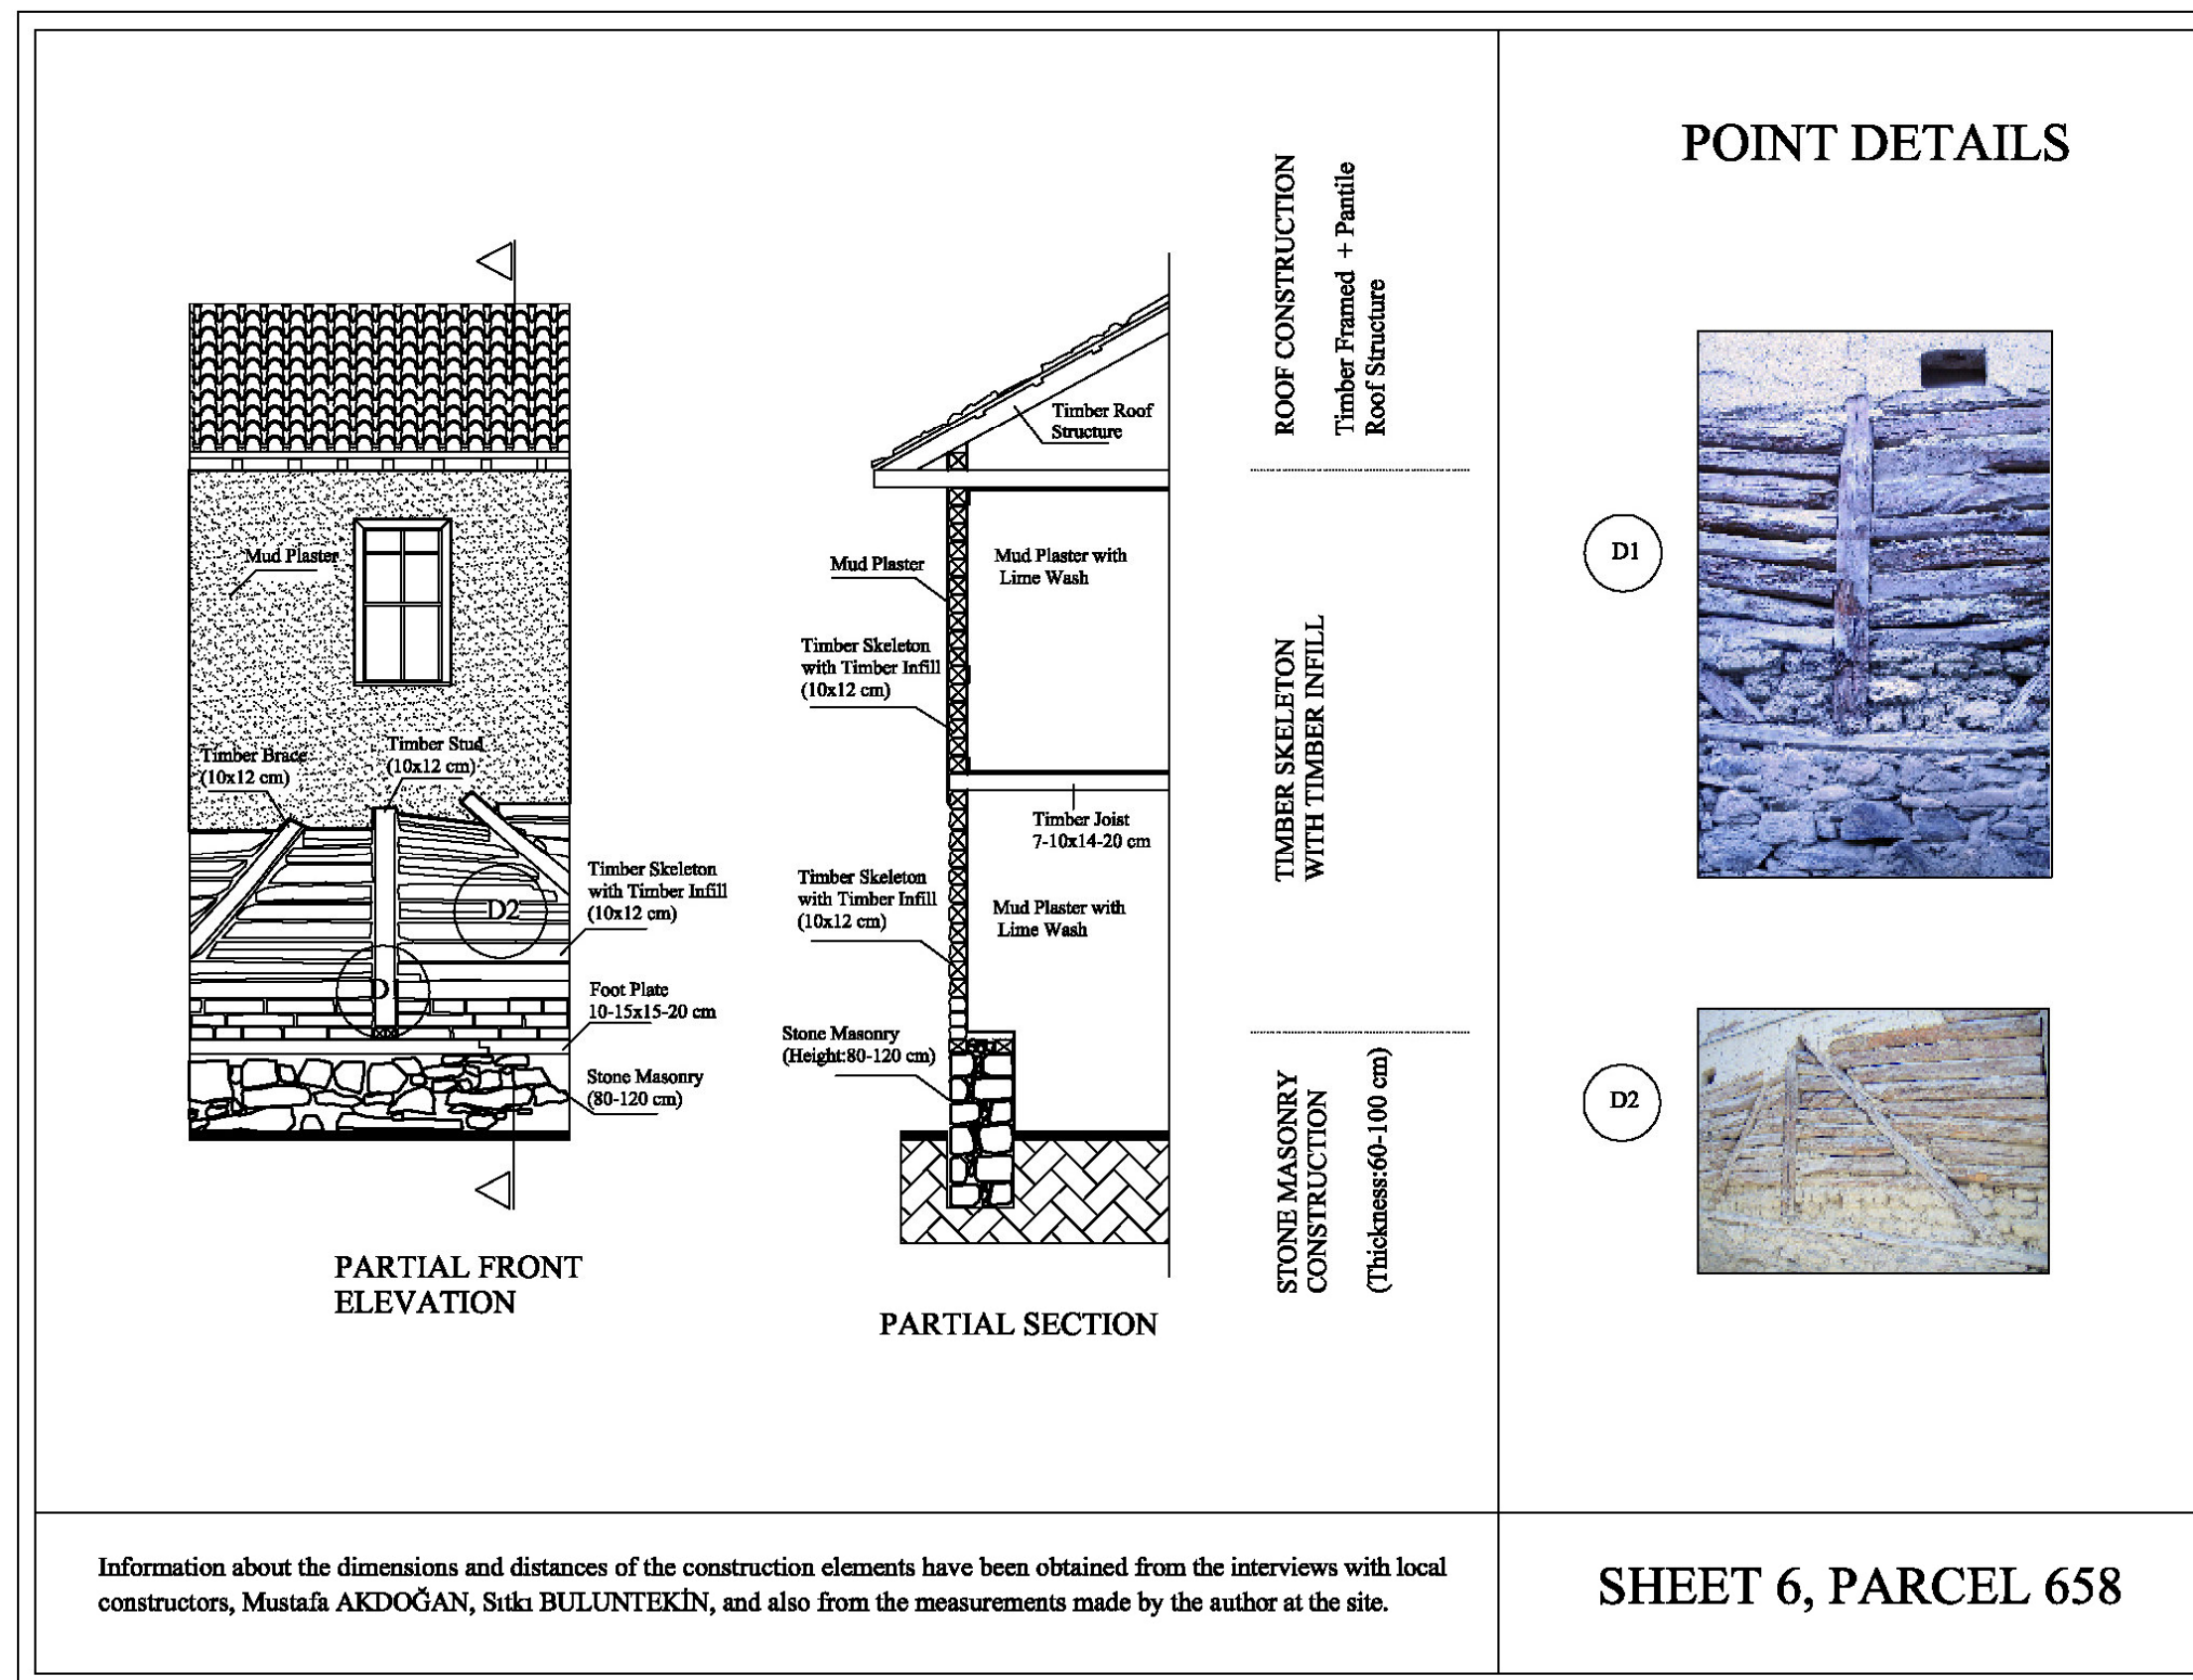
Construction Detail Drawings and Images of Hisar Evi
